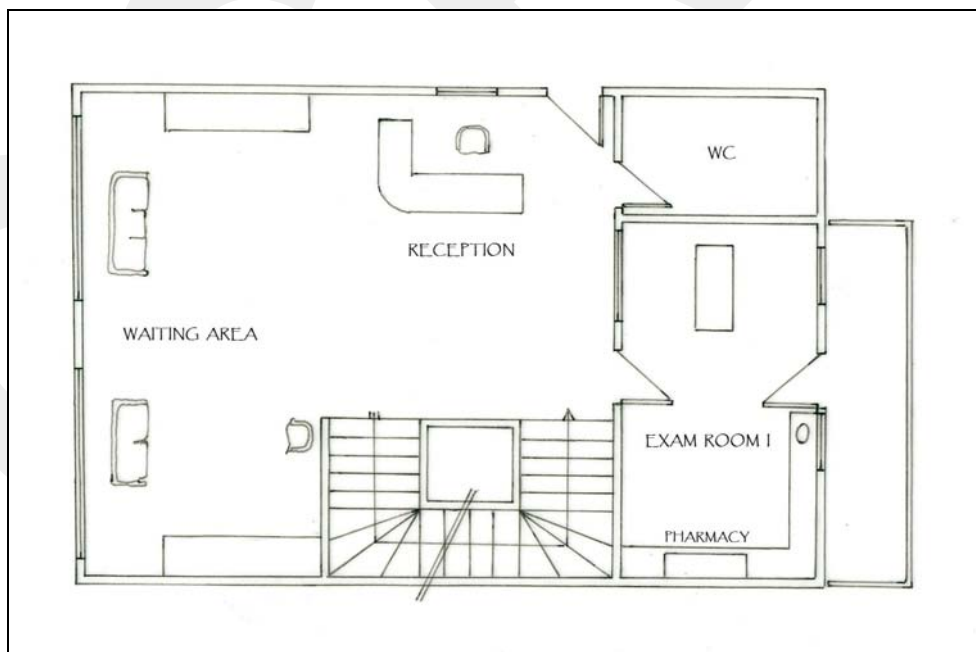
Ground Floor Plan of Beysukent Veterinary Clinic
